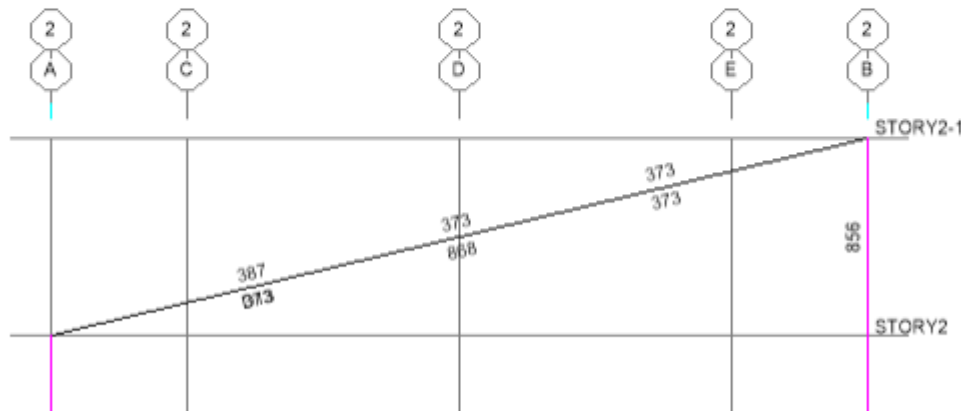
(e) Inclined beam reinforcement – Axis 2
